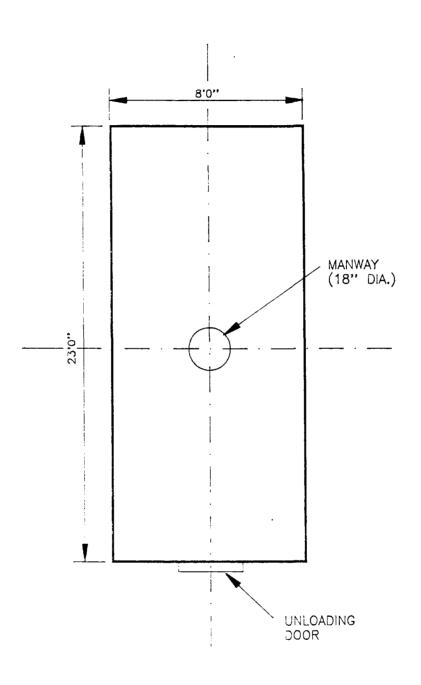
Plan View of On-Site Acid Treatment Unit.
